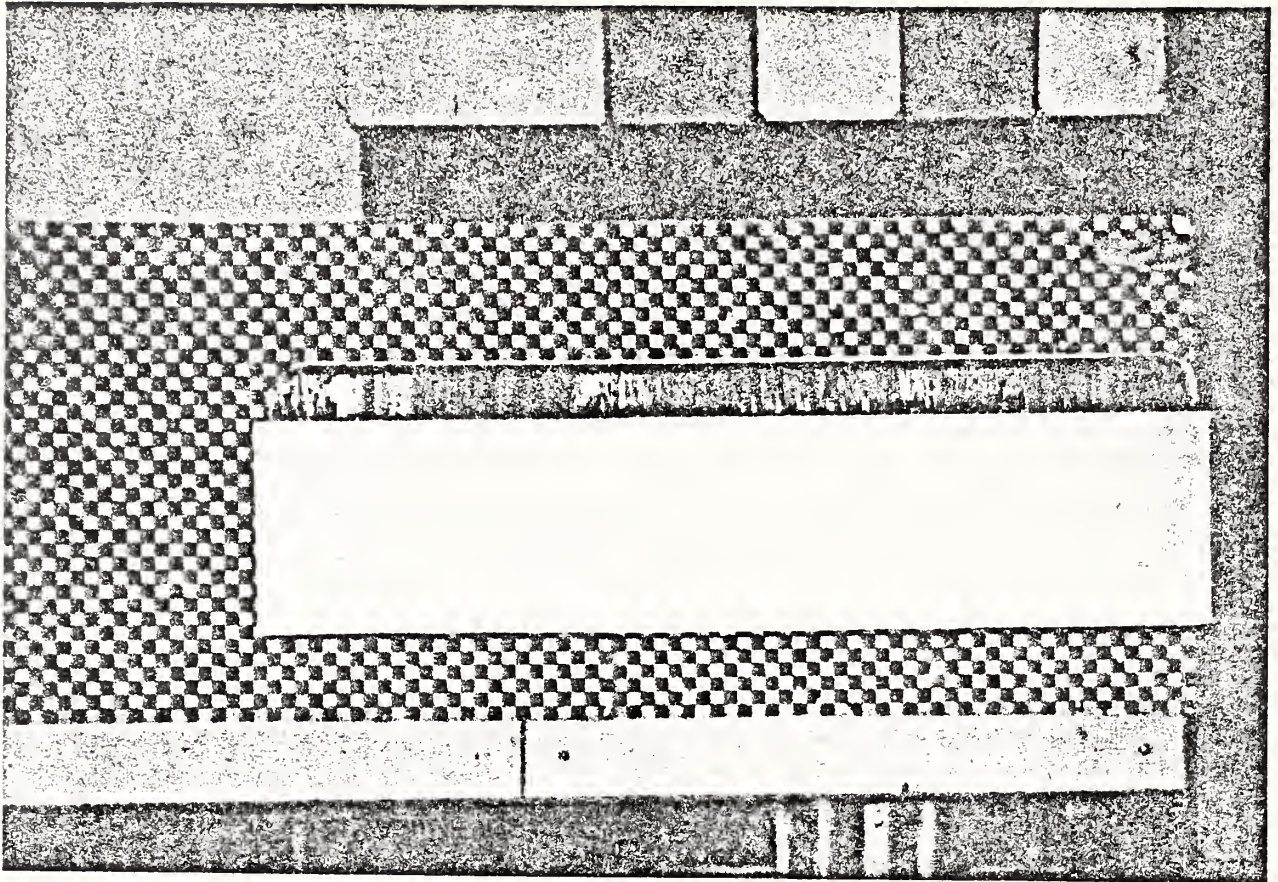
PRE-TEST MDB FACE - VIEW 1
